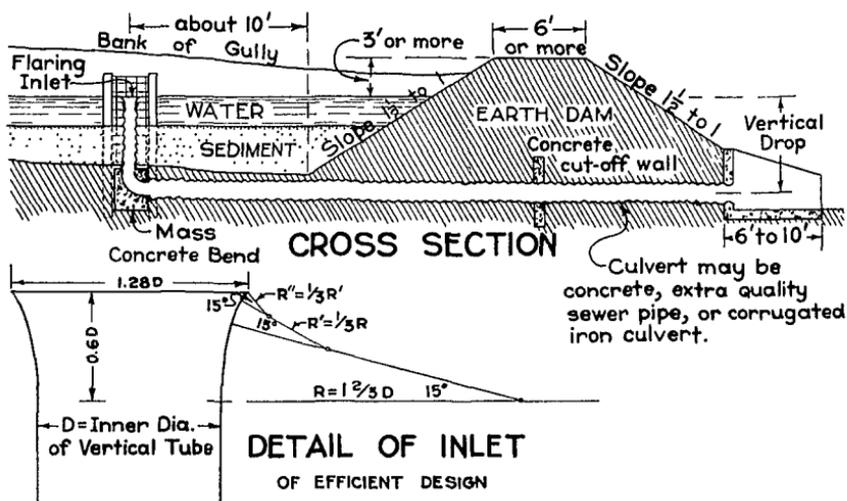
Earth Soil-Saving Dam and Culvert with Vertical Drop Inlet
